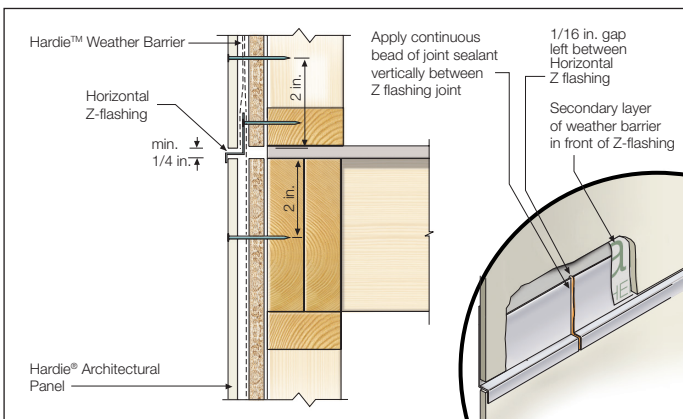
Upper Floor Junction Option 2 - Z Flashing
